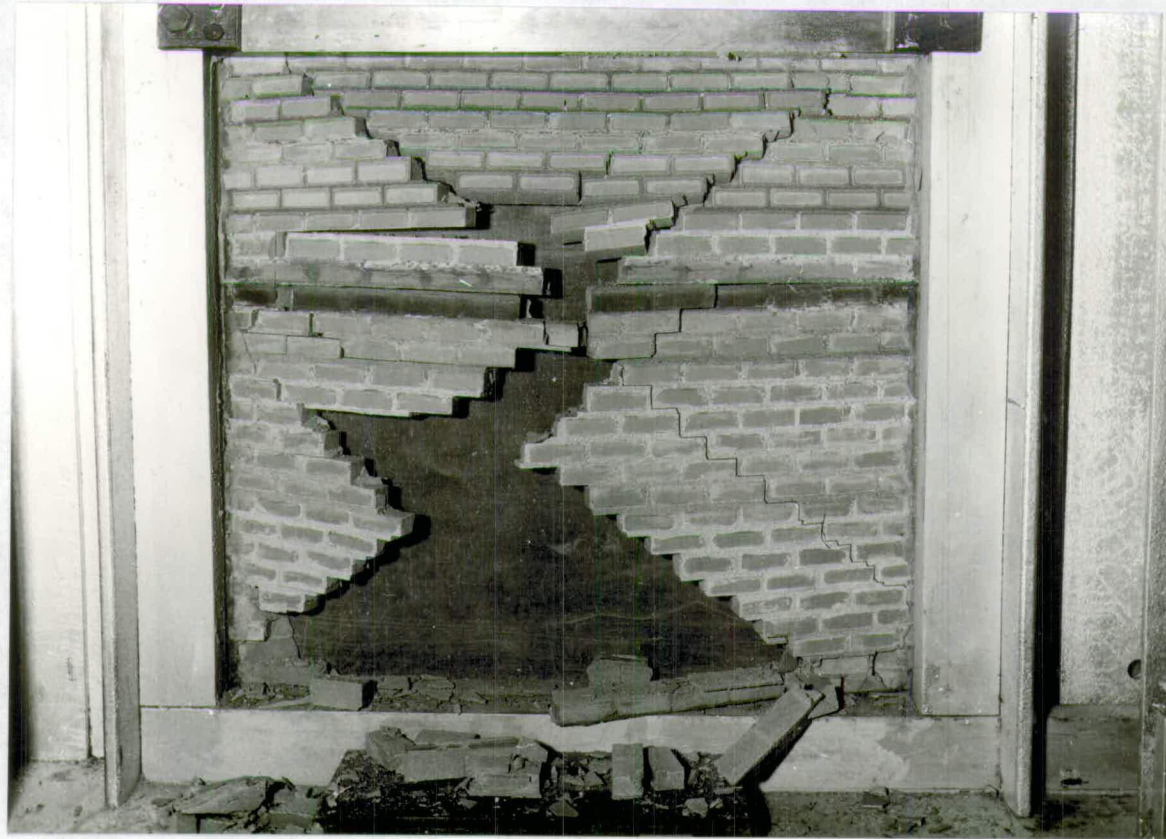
FAILURE OF WALL D1 - 4 SIDES SUPPORTED
